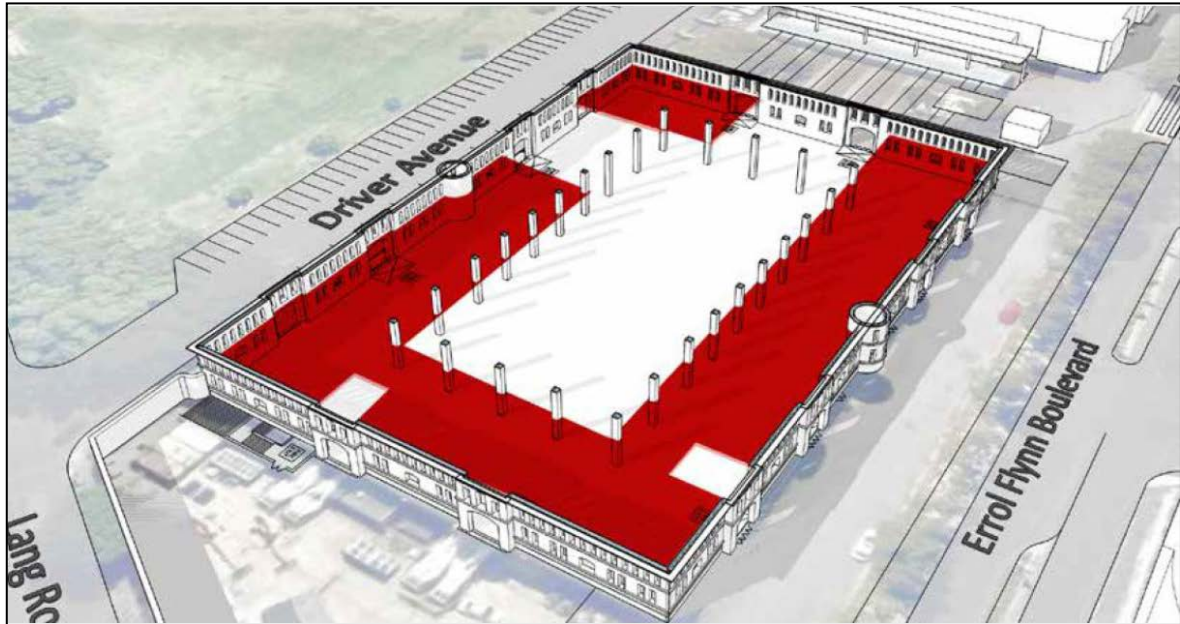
| Mezzanine layout (Source: Applicant's Design report).
